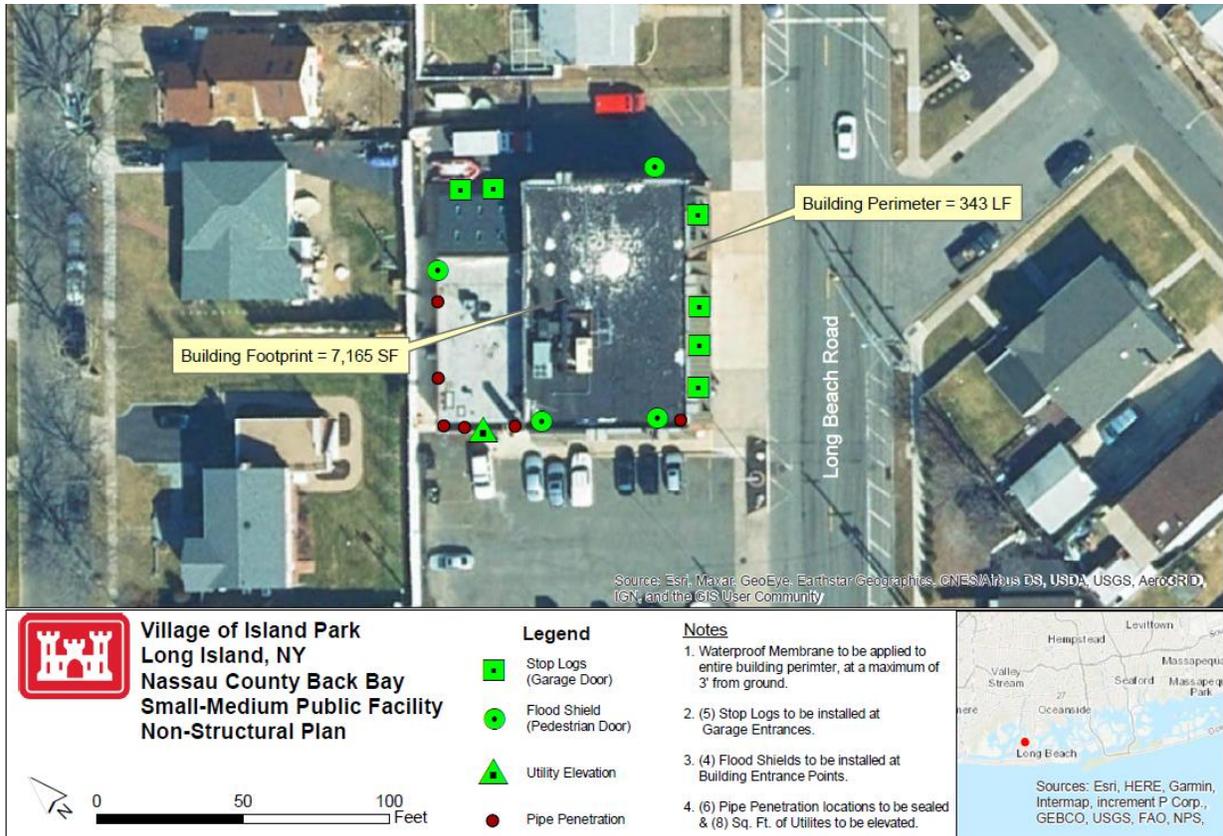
Island Park FD Dry-Floodproofing Concept Plan (Courtesy of USACE-NAP)
